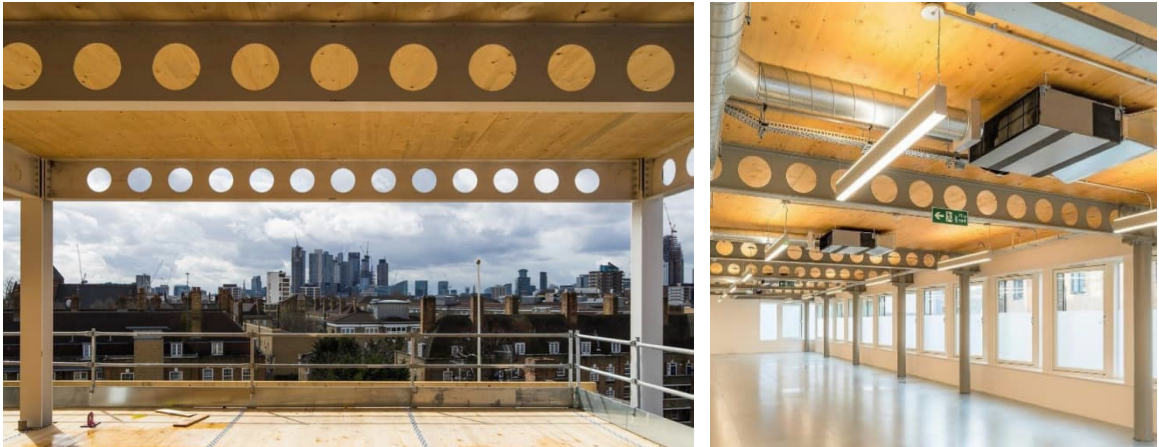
Demountable floor system using cross laminated timber (CLT) [36]
